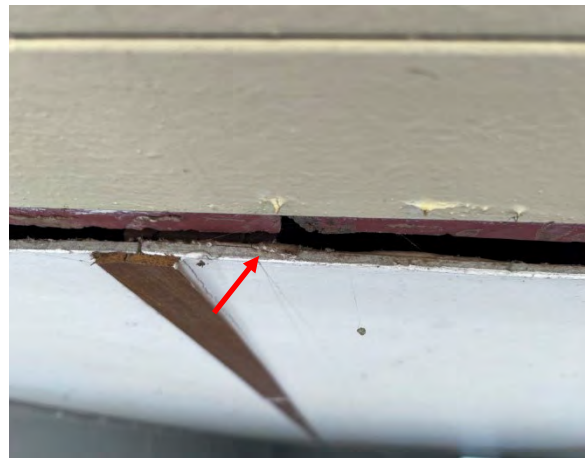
Maintenance Workshop – Internal asbestos fibre cement sheet ceiling lining
